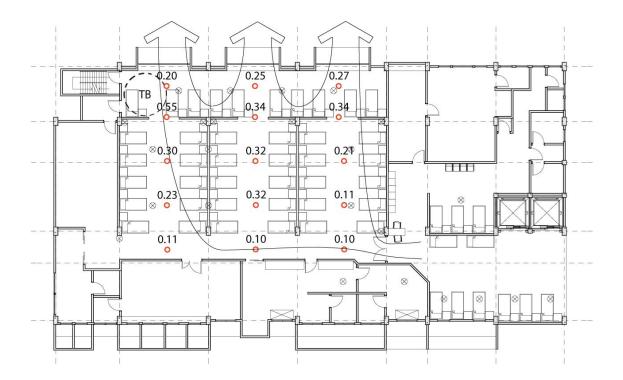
Floor plan and ventilation data of hospital E inpatient ward#2
